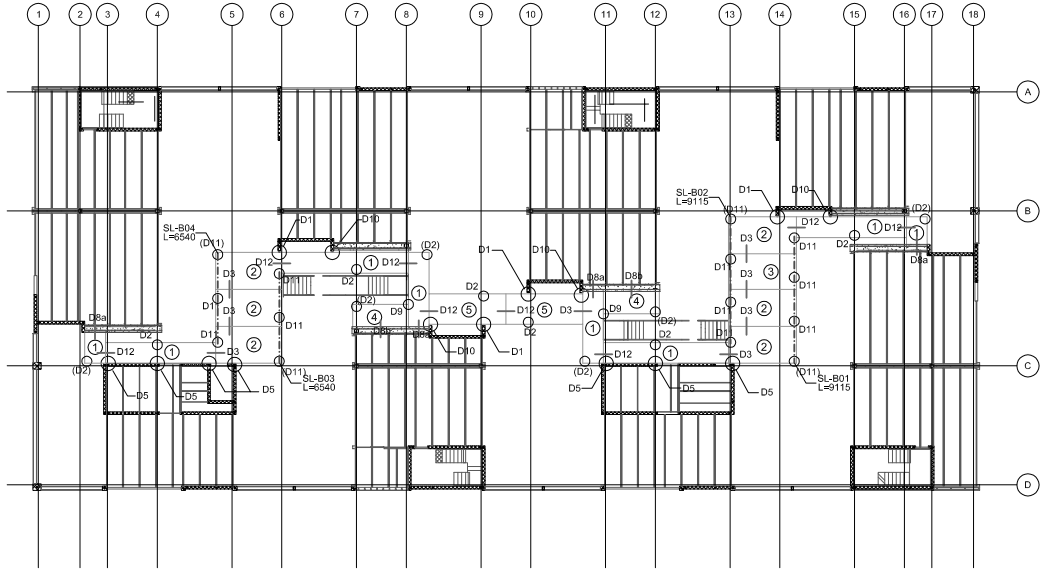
Plan of the building with the eight towers, which the super-light element has been integrated in along with the slab plan of the indoor pedestrian bridge
